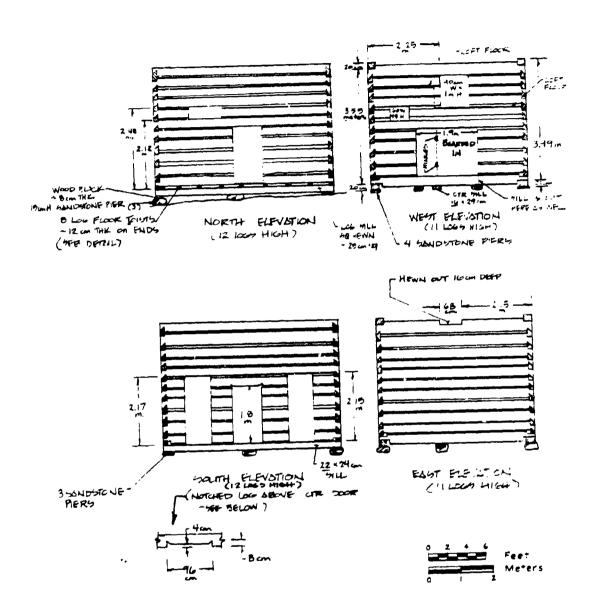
(continued) Field architectural planview and elevation drawings of the log structure in the barn at 41CO121.
